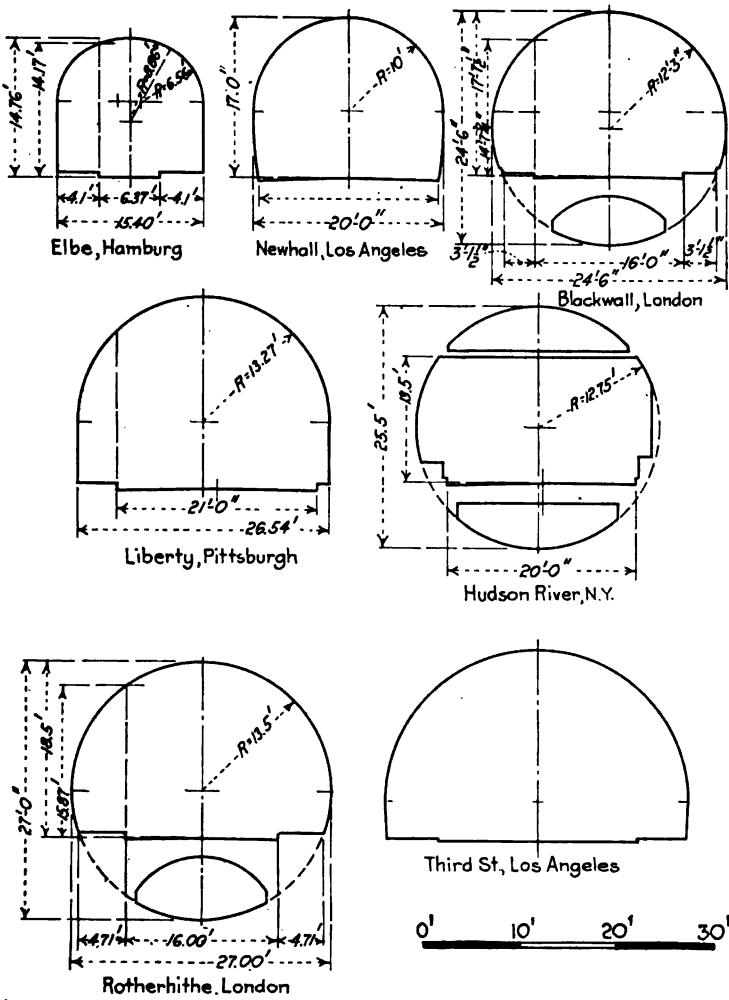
Cross sections of highway tunnels—one- and two-way.
